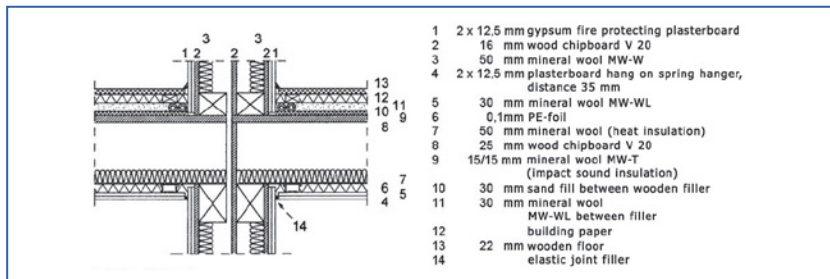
Connection between wall separating flats and floor (vertical section) [[2] - (Austria)].
